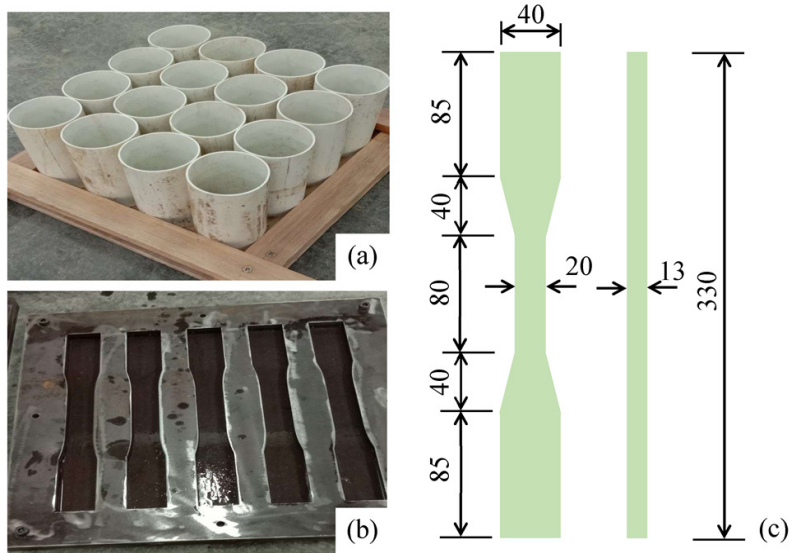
Specimen preparation: (a) cylinder moulds, (b) dog bone moulds and (c) dog bone dimensions (mm)
